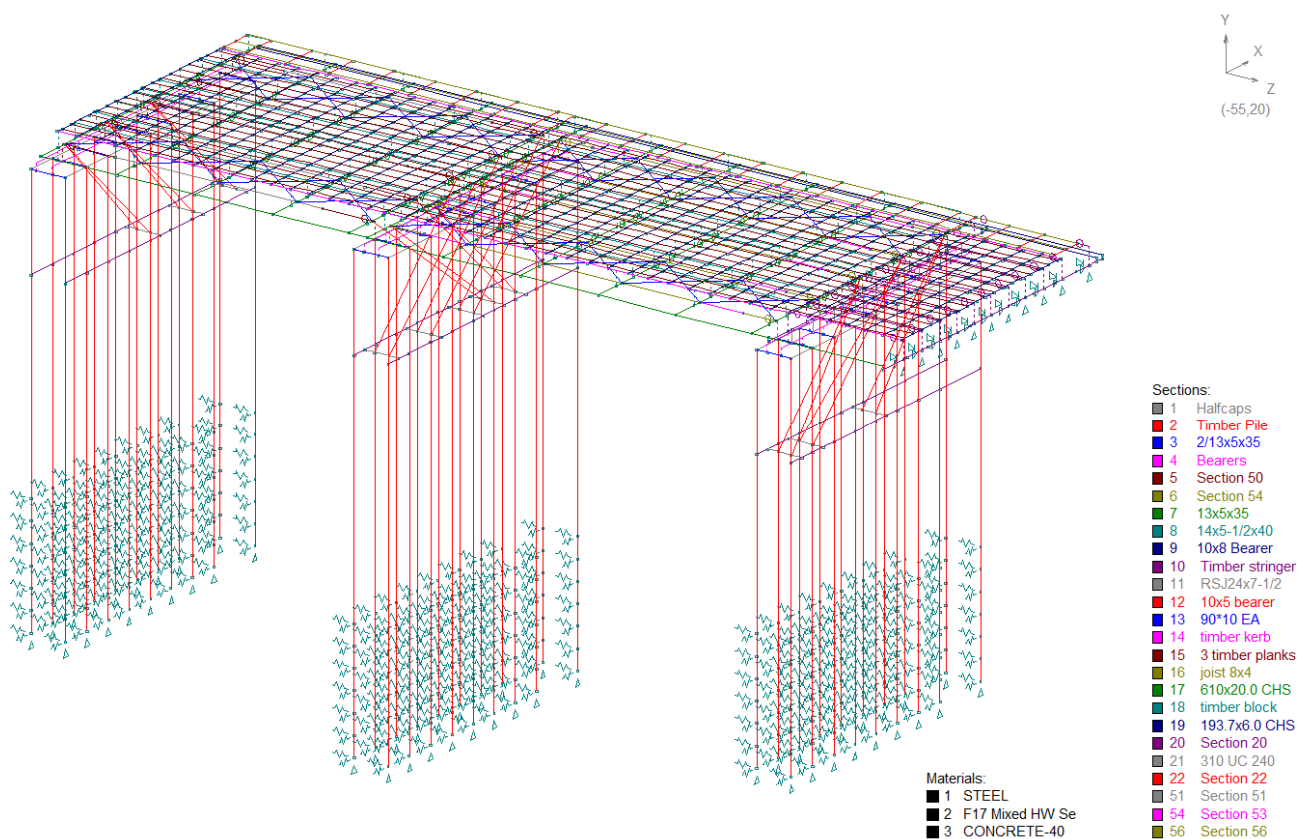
3D Space Gass model – 1 timber span, 70ft & 56ft navigation spans
